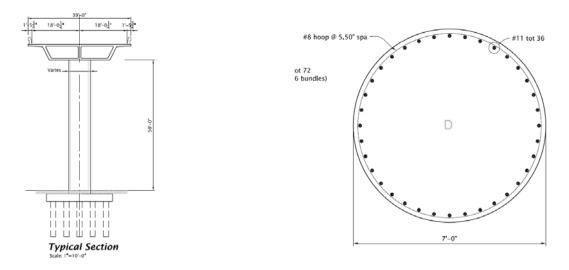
Bridge Column Type 11 (Ketchum et. al., 2004)
